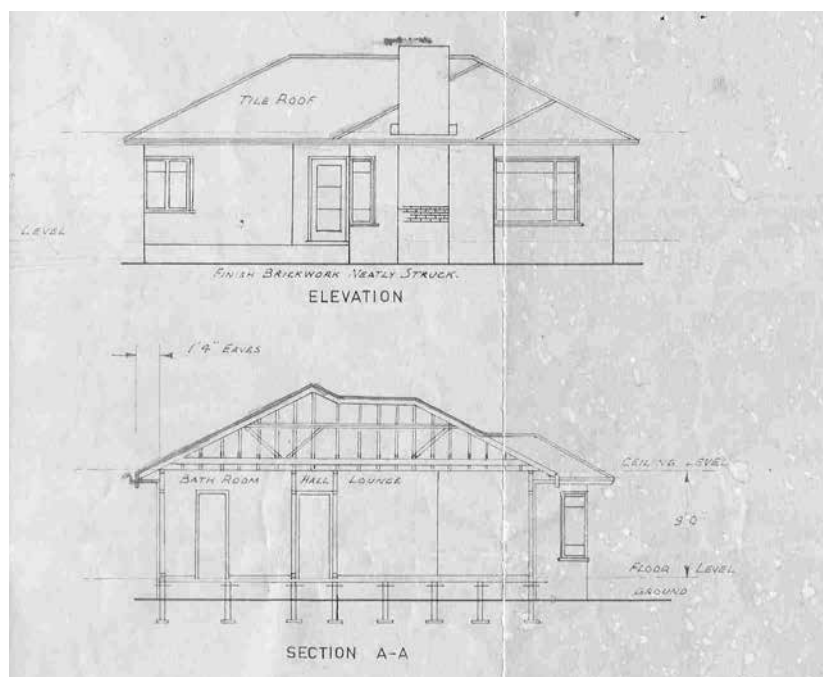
Building permit for Laura's house, 1956. Source: Laura's private collection.
